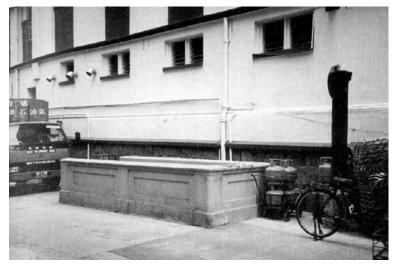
Underground public latrine at the intersection of Second Street and Western Street.
